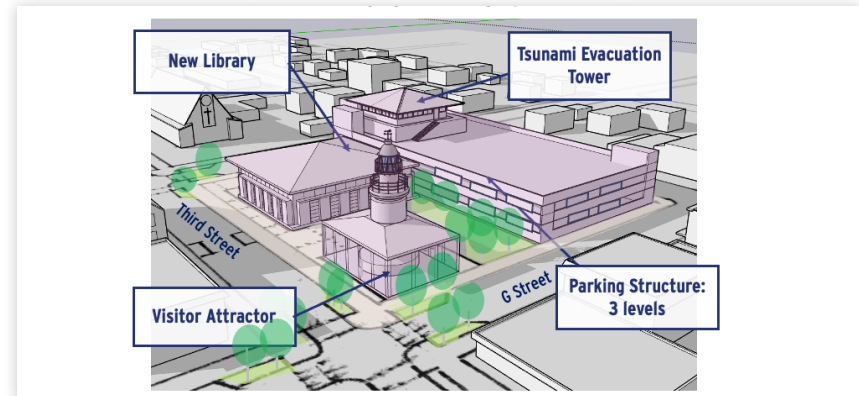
Anchor Development Site- Third Street and G Street Option 2 Visitor Attraction
